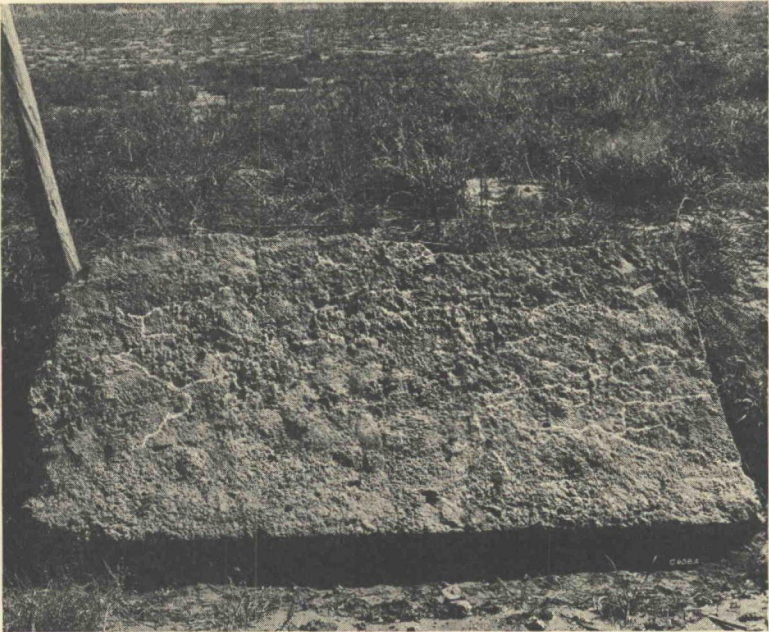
Bottom View of Pavement Slab Showing Map Cracking
